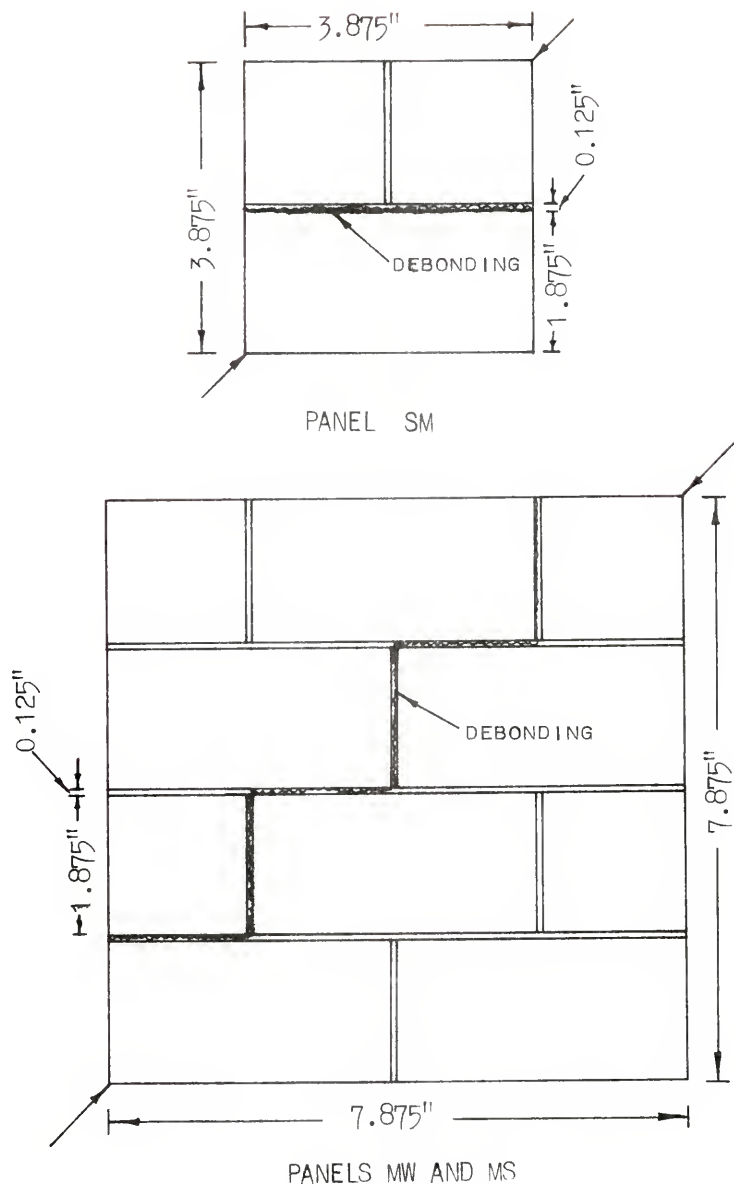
Experimentally observed failure modes in hollow concrete masonry panels.
